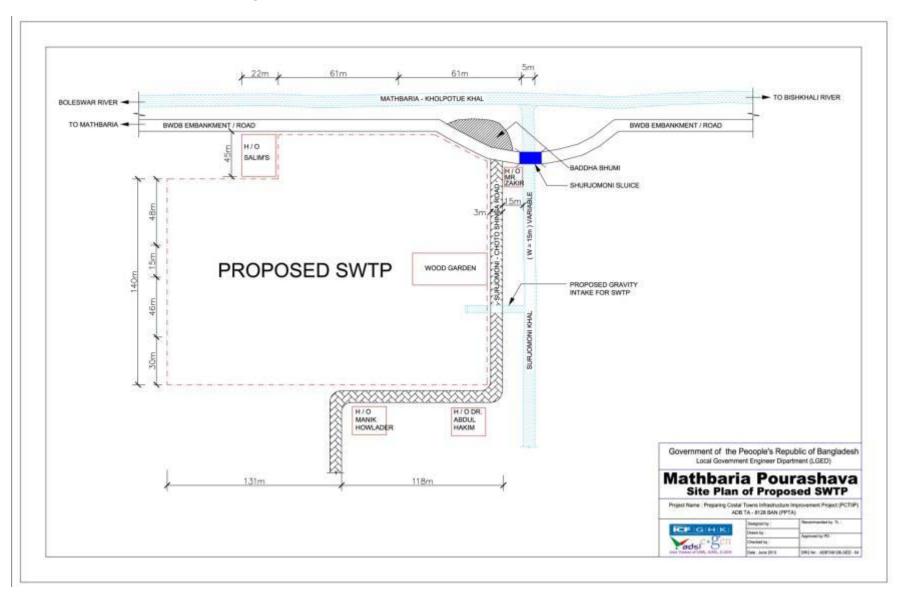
Mathbaria Surface Water Treatment Plant – Site Plan
